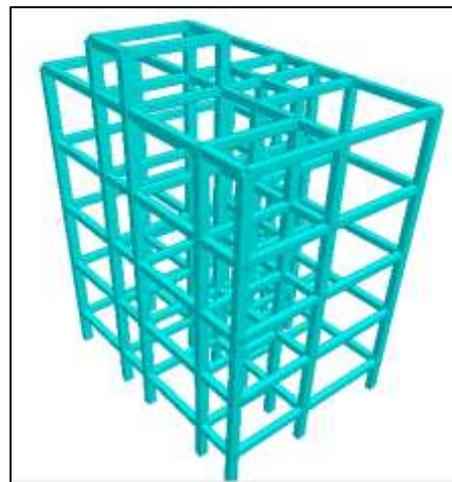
Rendered view of RCC frame in STAAD.Pro
